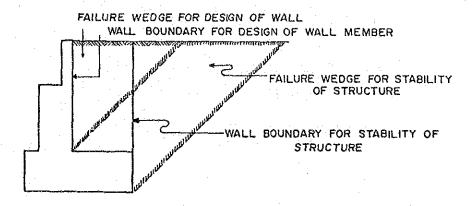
FAILURE WEDGE AND WALL BOUNDARY
